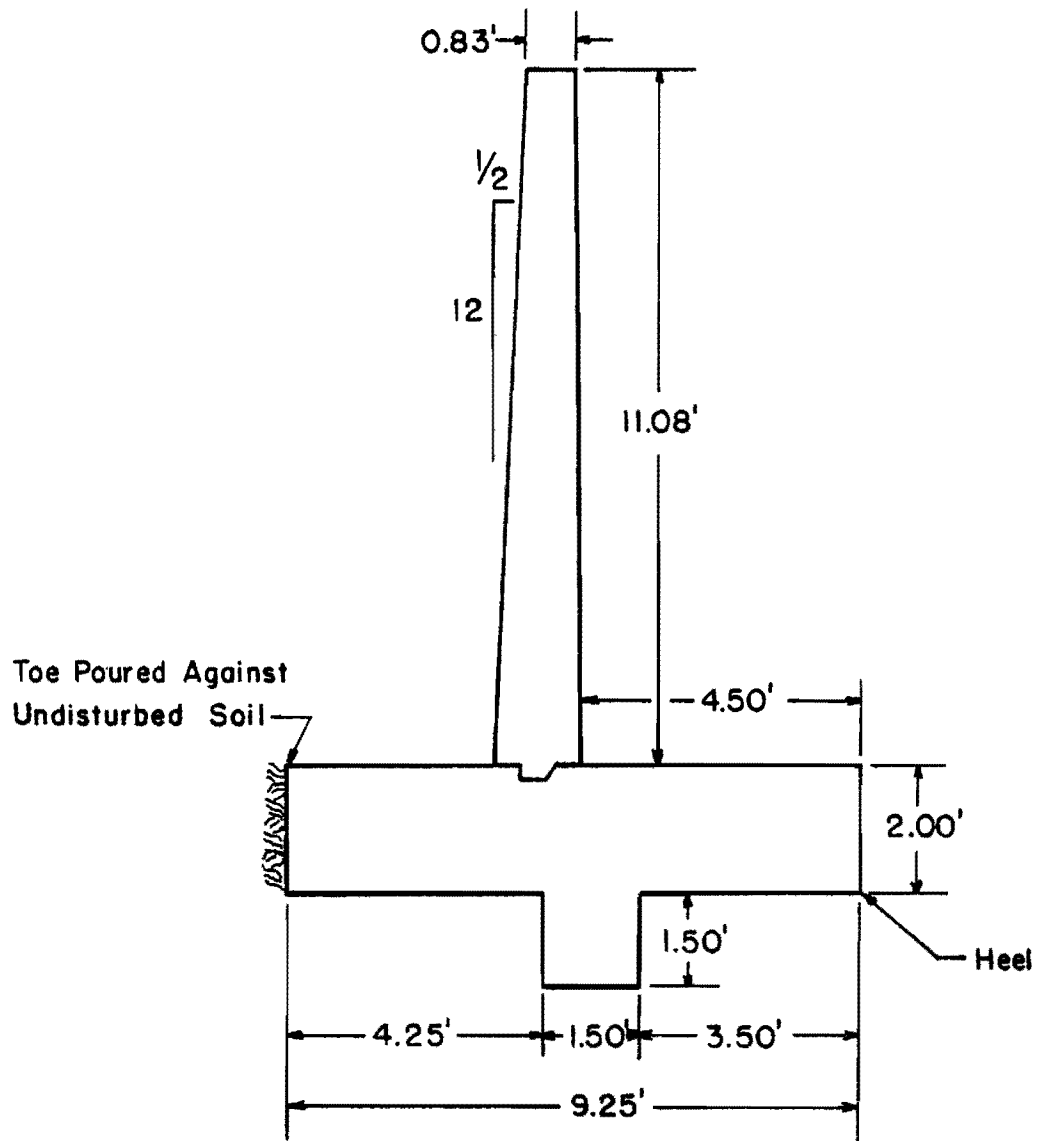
Cross Section of Instrumented Section of Panel No. 3 (1ft= 0.305 m)
